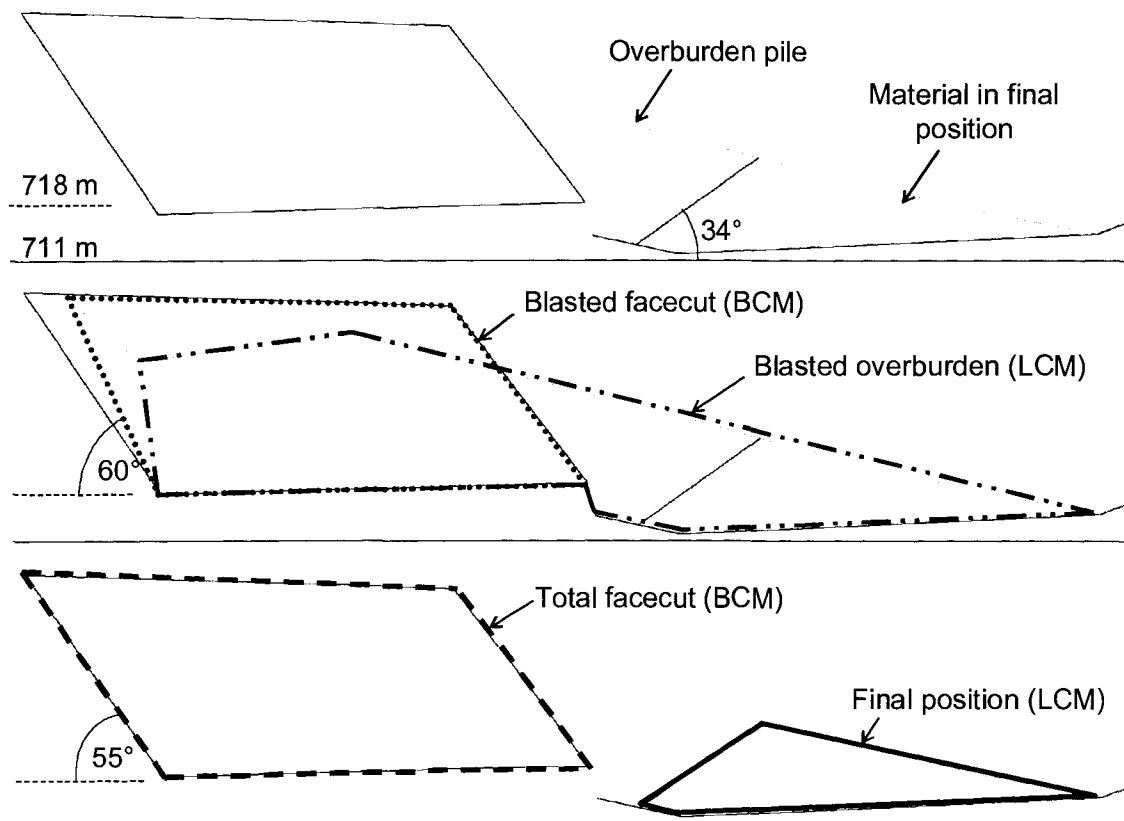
Typical pit cross section for cast blast #6 based on conventional survey coordinates (outlined areas are used to calculate S_w and E')
